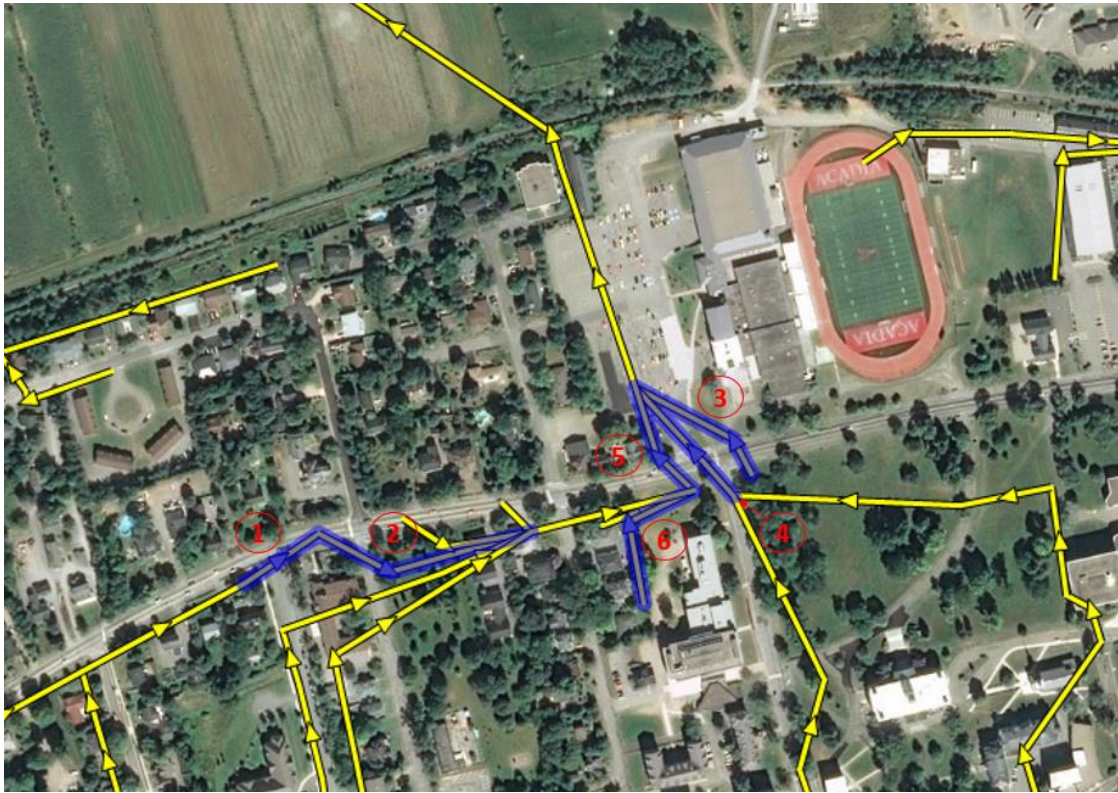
Proposed Upgrades for Stormwater Pipes near University Avenue and Main Street
